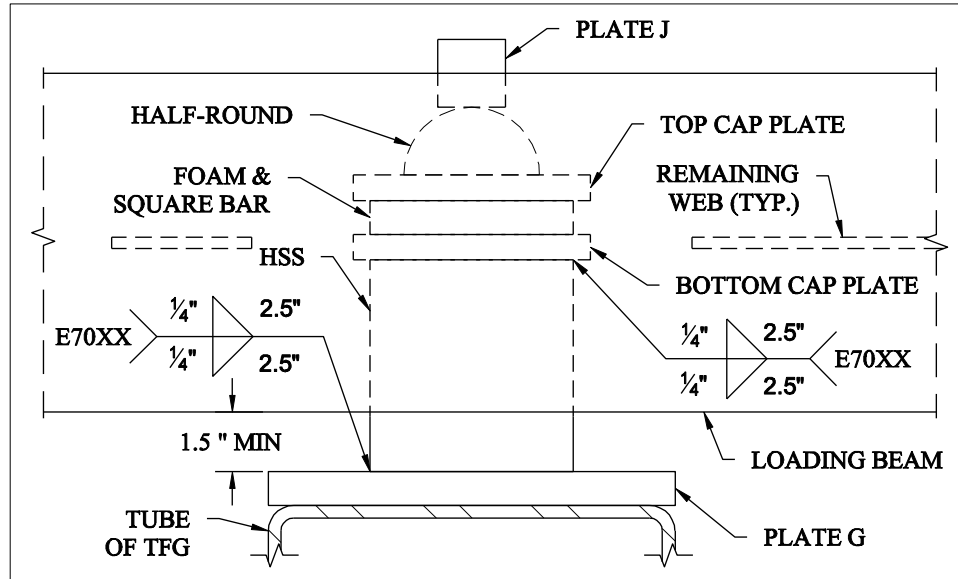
Detail B of Figure 5.3 - parallel plane cross section view of load bearing assembly at Section B
